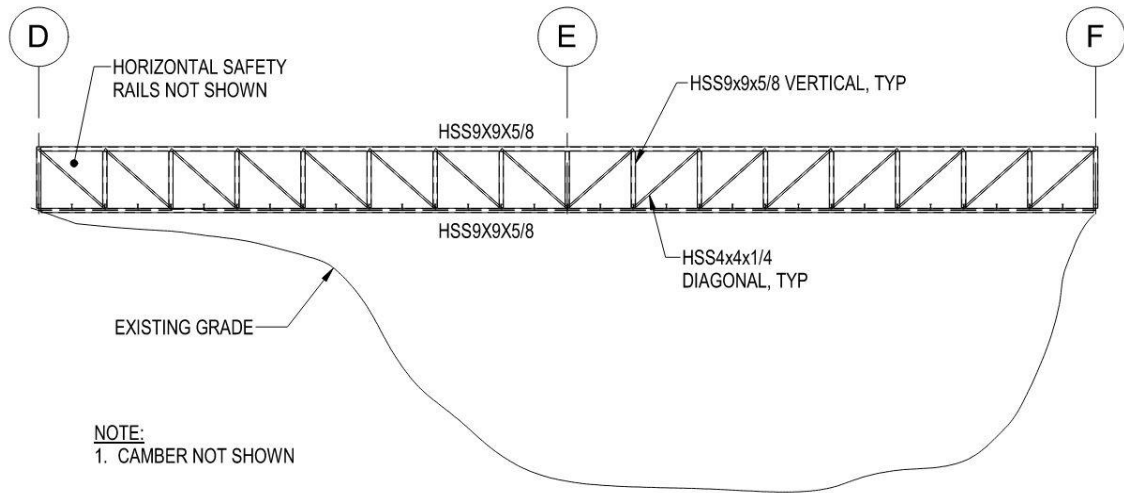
TRUSS BRIDGE ELEVATION, SPAN 180'
